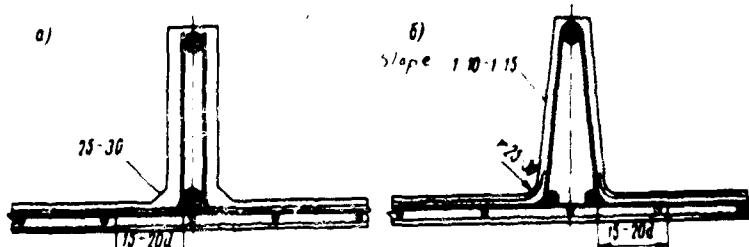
Configuration of cross section of ferroconcrete beams strengthened by reinforced concrete plates: a - in the fabrication of the designs with beams upward; b - in the fabrication of designs with the beams downward.
